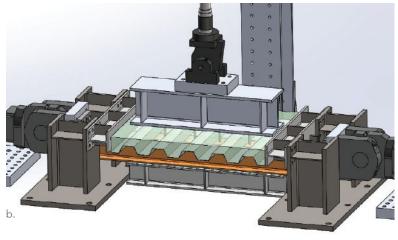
, an isolated fastener test specimen, and 1b, a deck sidelap test setup.
